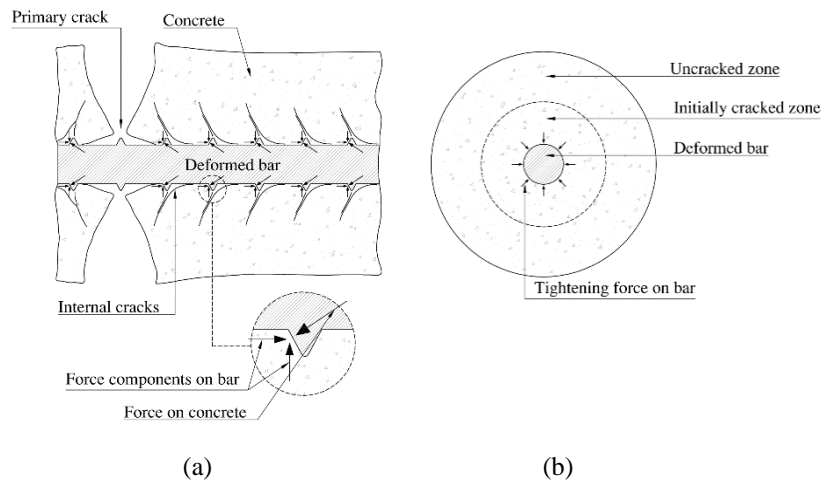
Schematic deformation of concrete surrounding a deformed steel bar after the formation of internal cracks; (a) longitudinal section of the axially loaded specimen and (b) cross-section (Goto 1971);
